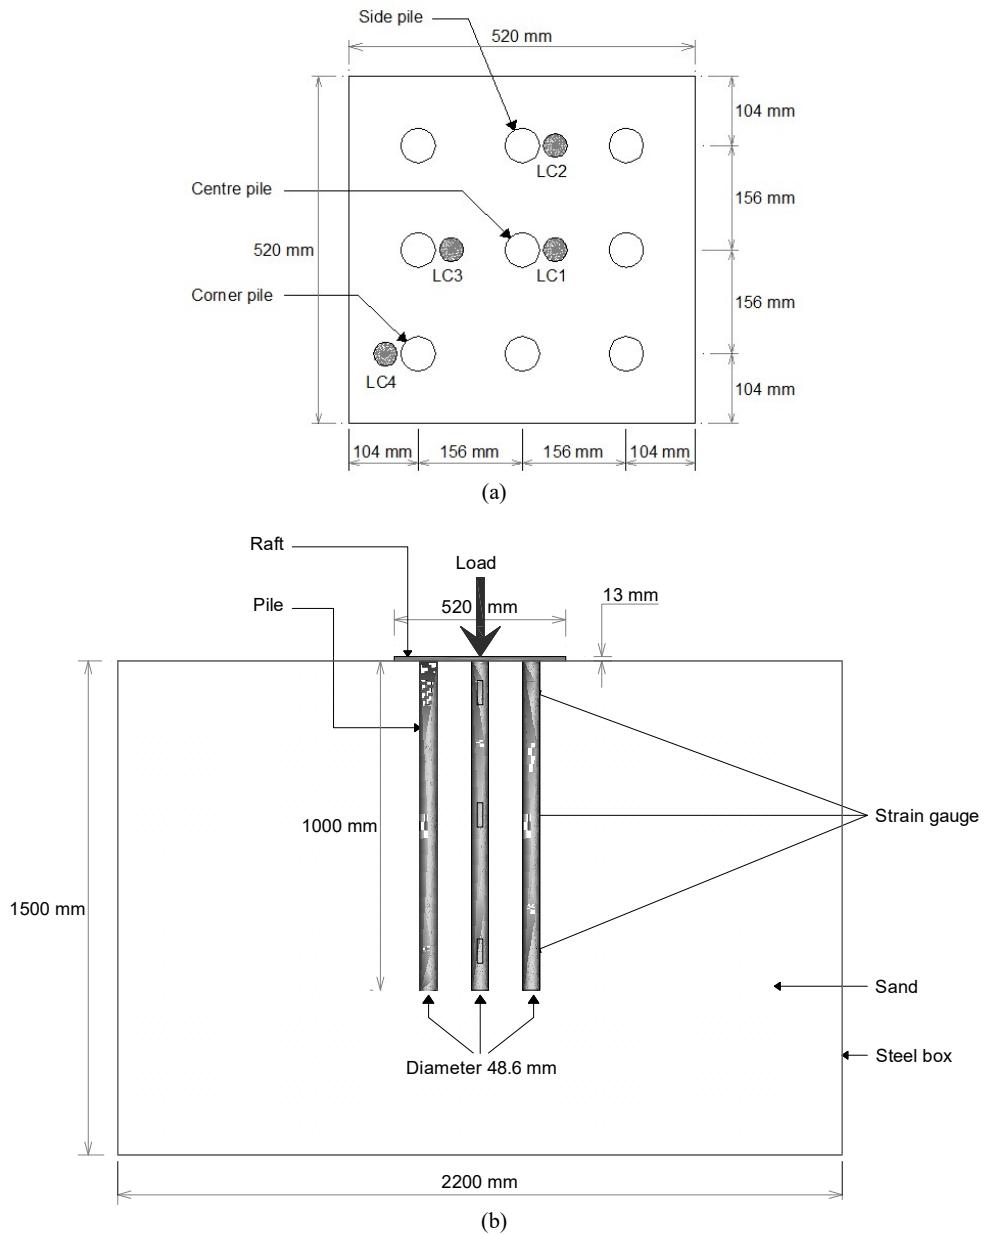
Schematic diagram of laboratory 3x3 group piled-raft model: (a) Plan view; (b) Cross section view
